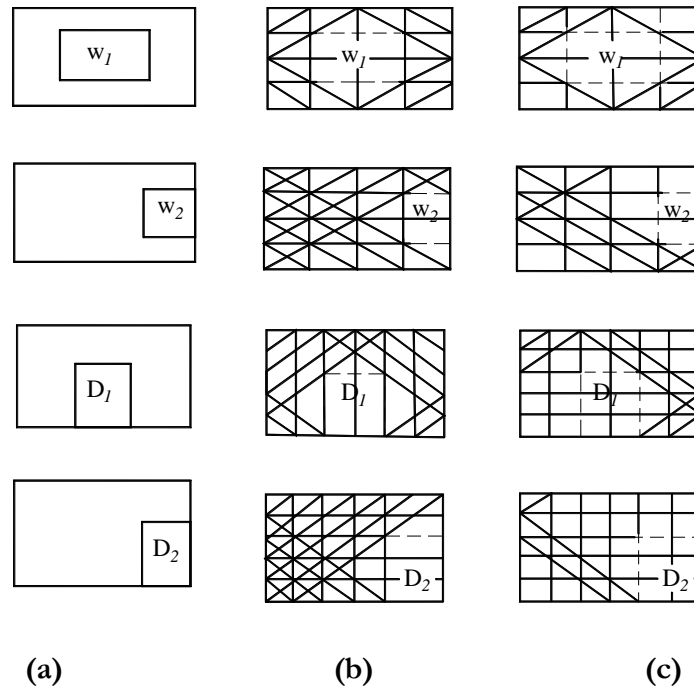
Formulation of struts around openings: a) position of openings; b) struts for infills with a monolithic connection with the surrounding frame; c) struts for infills with a non-monolithic connection with the surrounding frame (Thiruvengadam, 1985)
